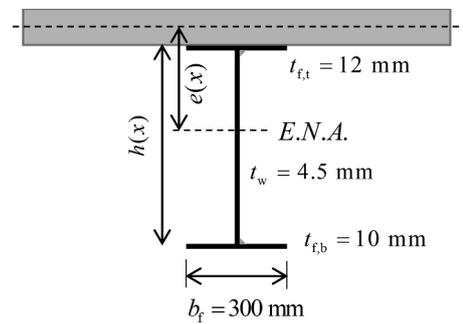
Cross-section of the steel tapered beam, including prefabricated concrete floor element, considered in the case study.
